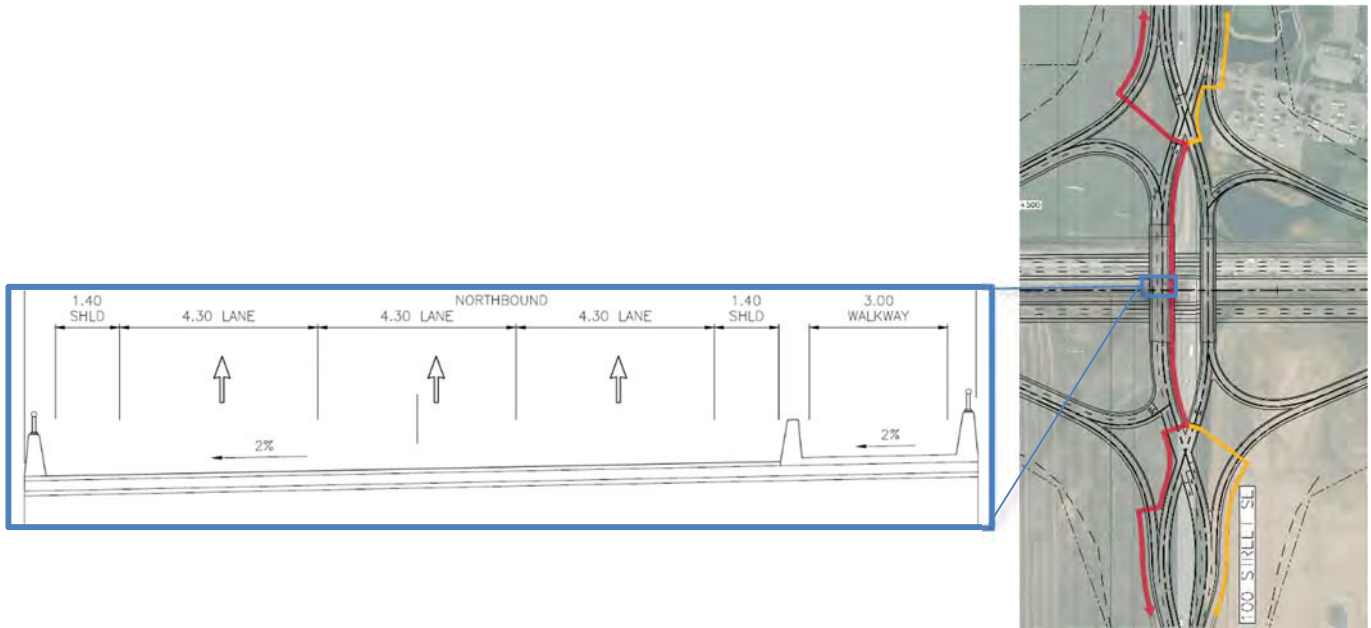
100 ST SE INTERCHANGE ACTIVE TRAVEL FACILITIES (RIGHT) AND CROSS SECTION (LEFT INSET CROSS SECTION)
